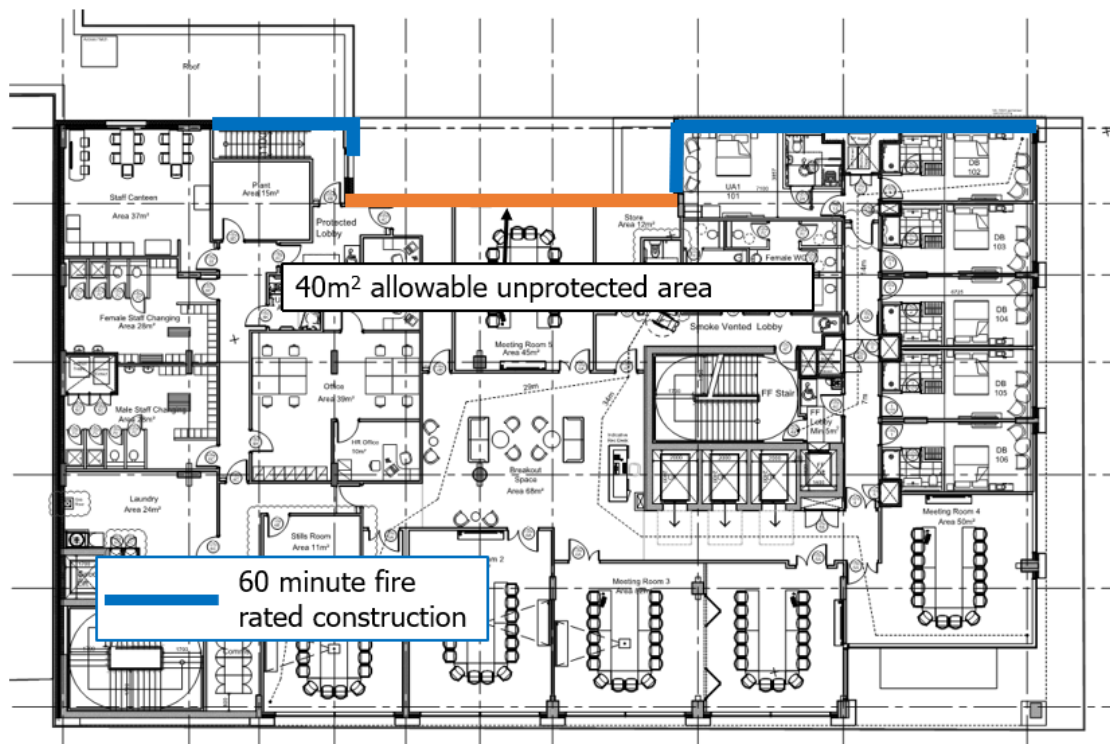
Extent of protection required to the external façades of the hotel building at First Floor
